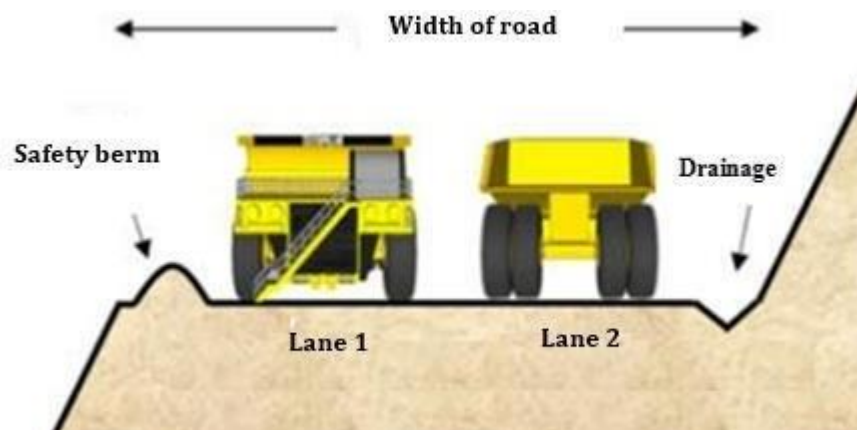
Scheme of the width of road, drainage facility and safety berm [11].
